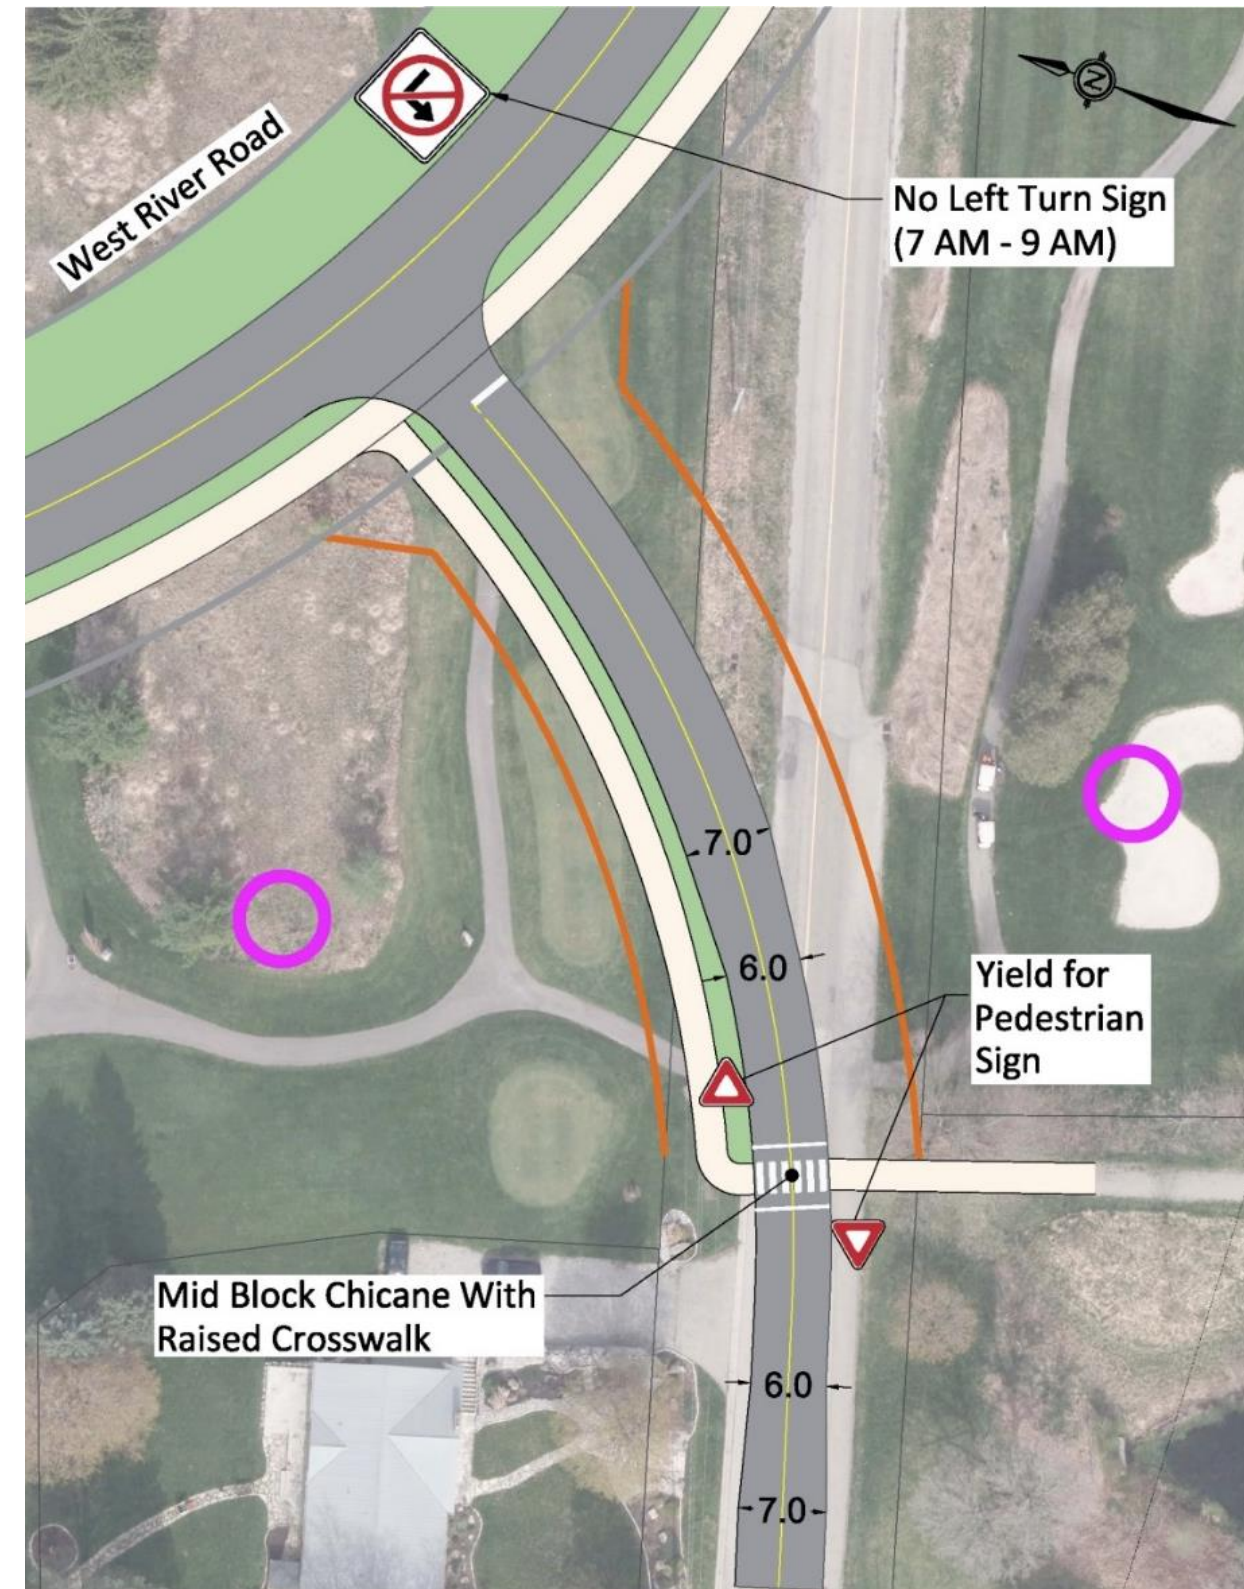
Alternative C – West River Road/Paris Links Road Connection
